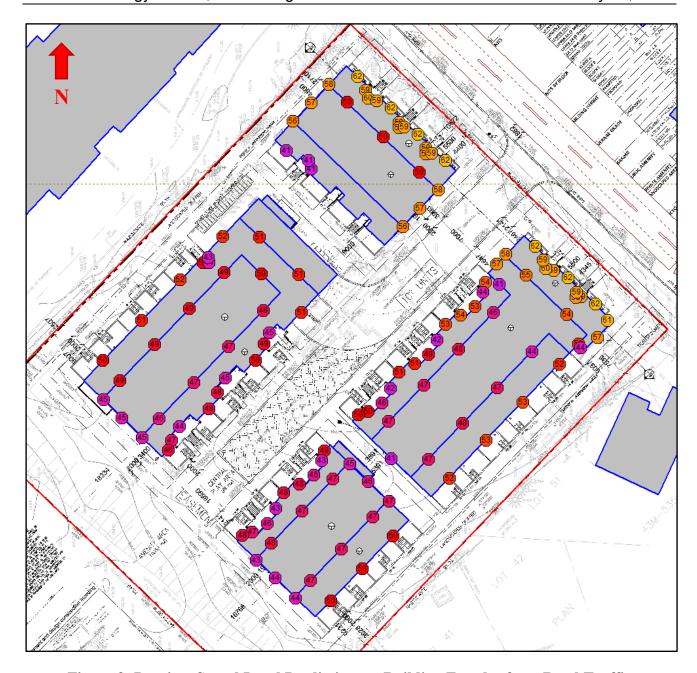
Daytime Sound Level Predictions at Building Façades from Road Traffic
